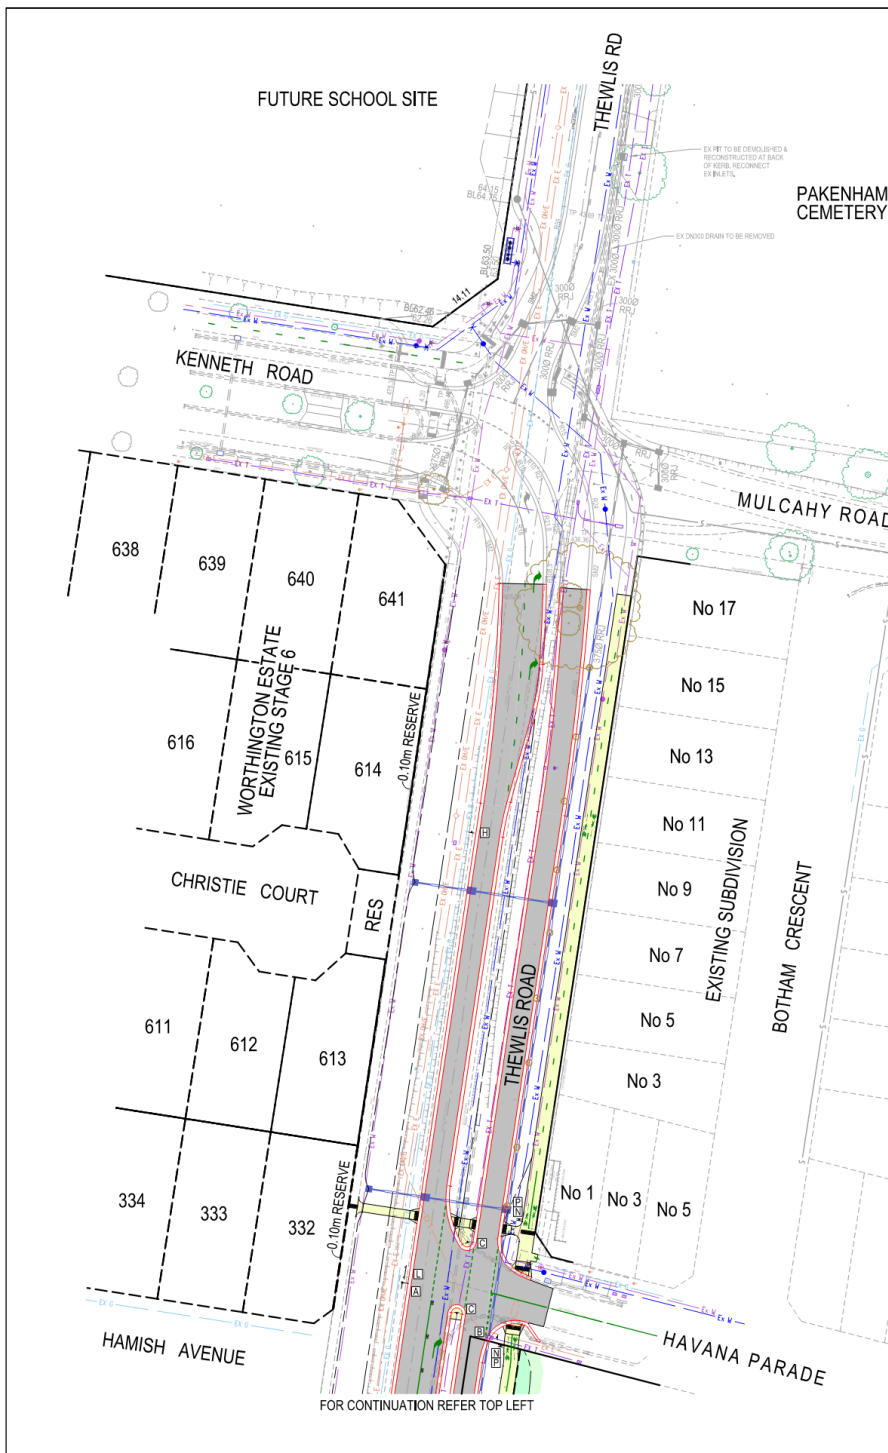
Worthington Estate – Thewlis Road / Havana Parade and Thewlis Road / Kenneth Road intersection layouts
